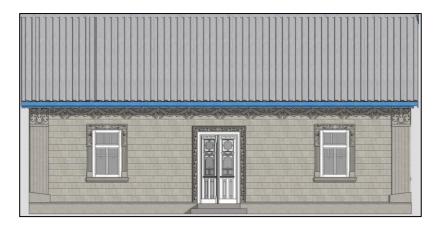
Front view of facade of a 1970s style house from Southern Bessarabia. Wide façade
